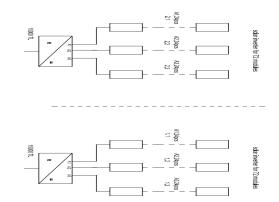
Example for inverter plan and wiring for a 35 kW solar power system
